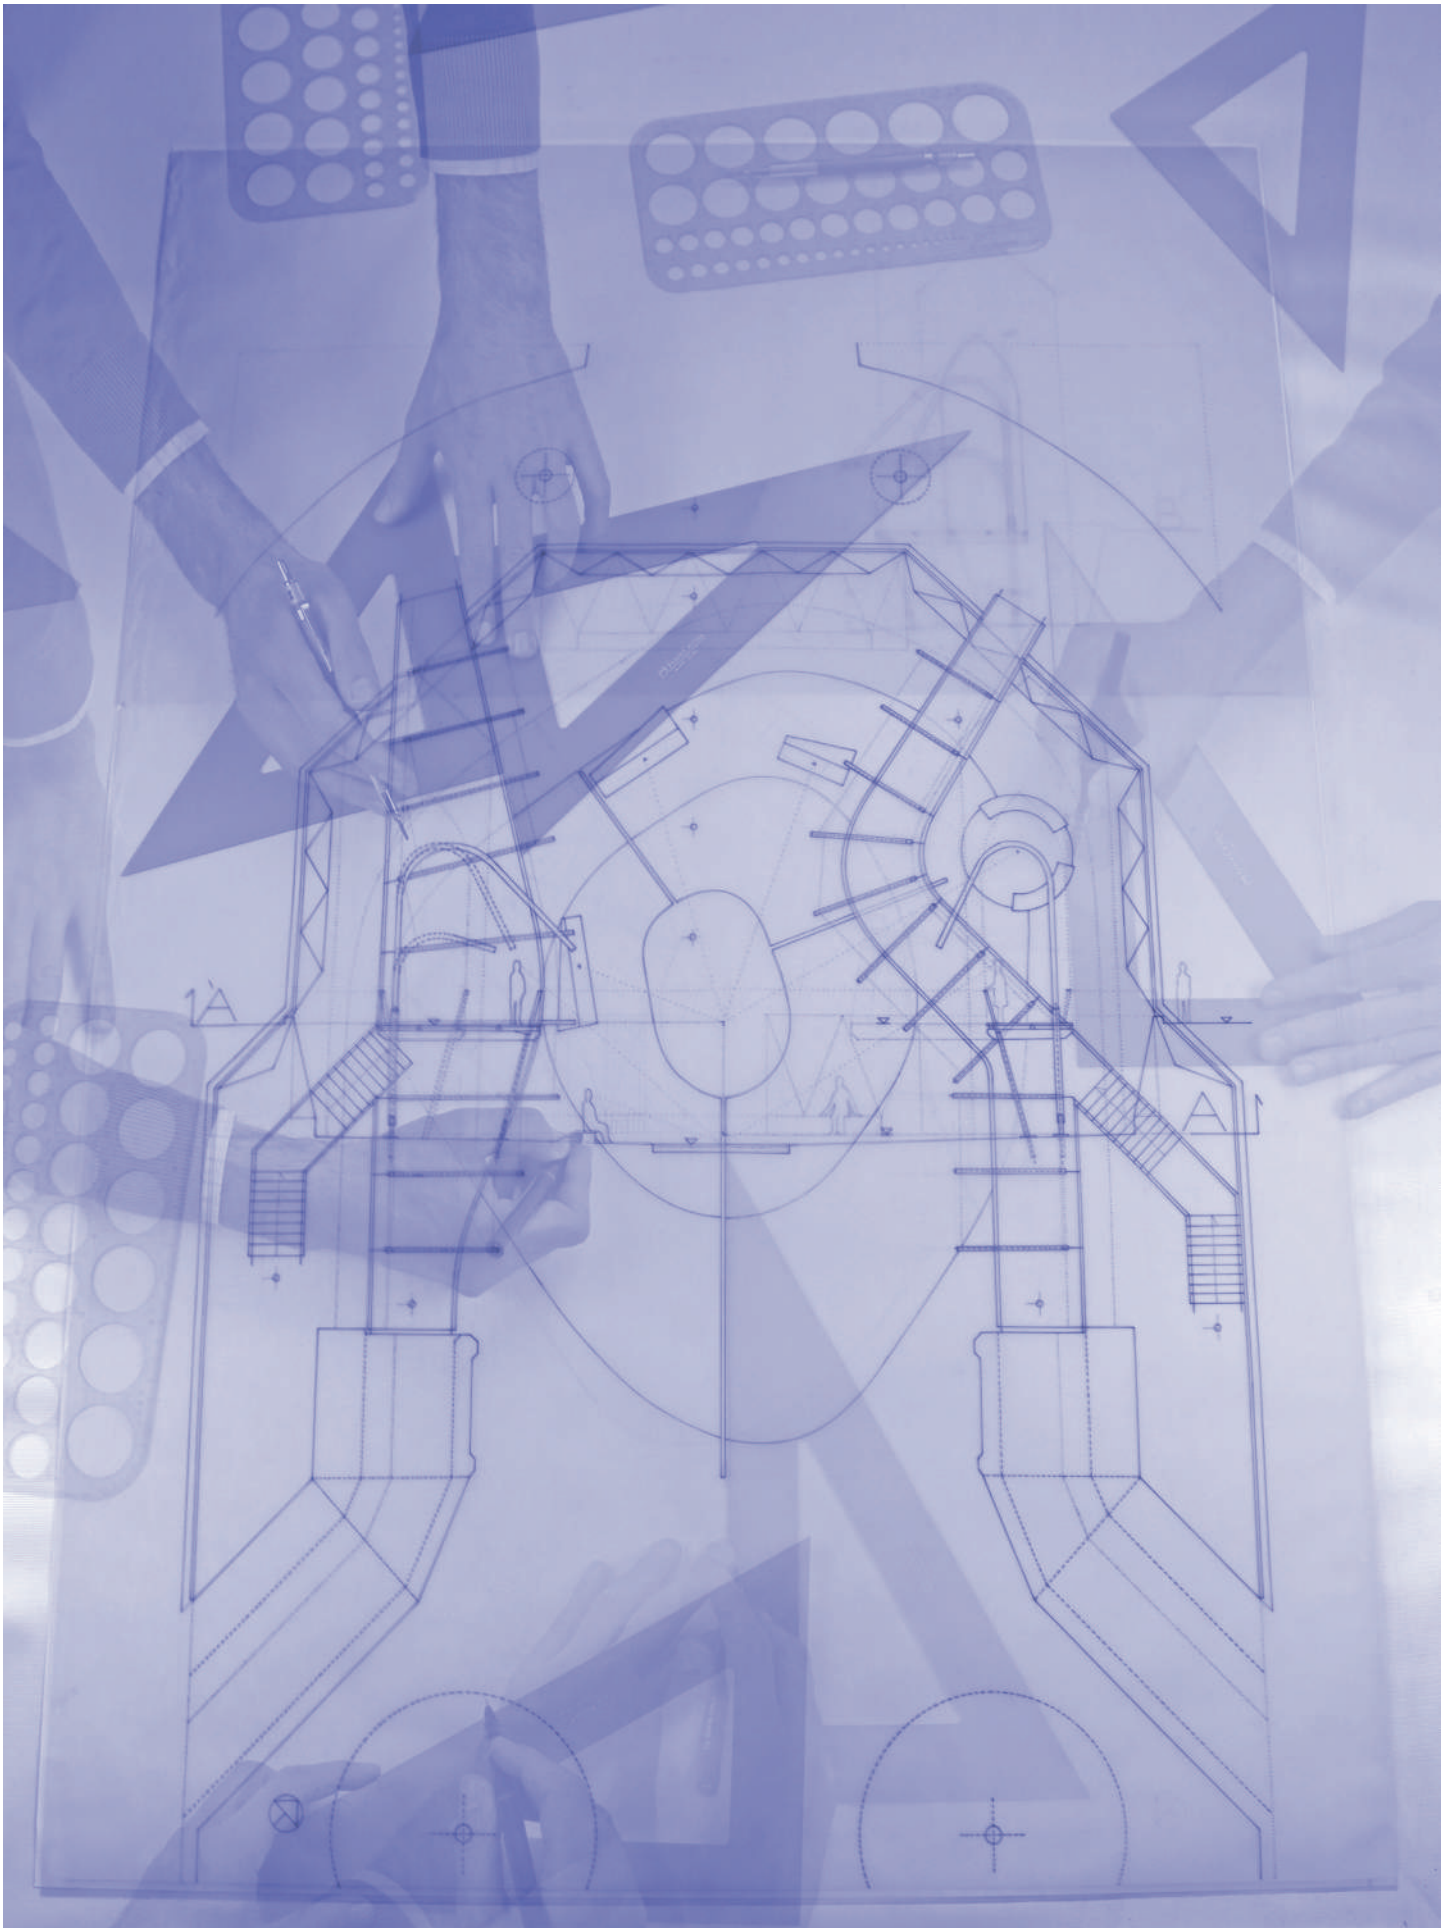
Photographic overlay of the development of the proposed architectural plan, elevation and cross sections. Ink on velum and digital collage.
